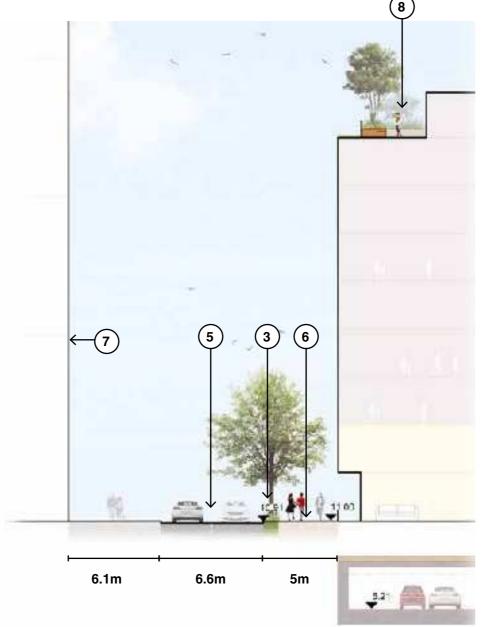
Section L-L looking North through the roundabout looking towards block B1
